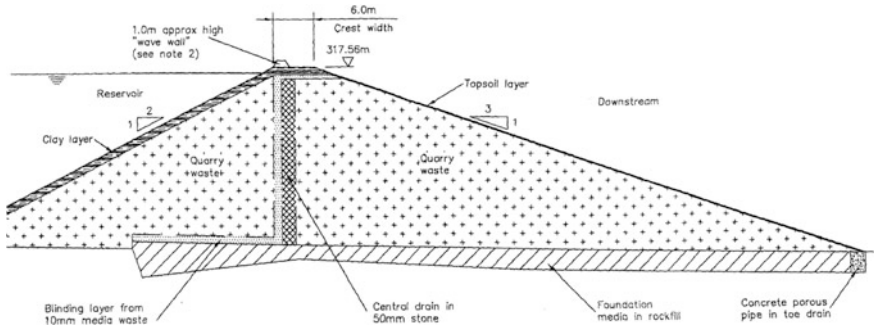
Water-retaining embankment, Blakedon Hollow TMF, UK (Cambridge 2010)
